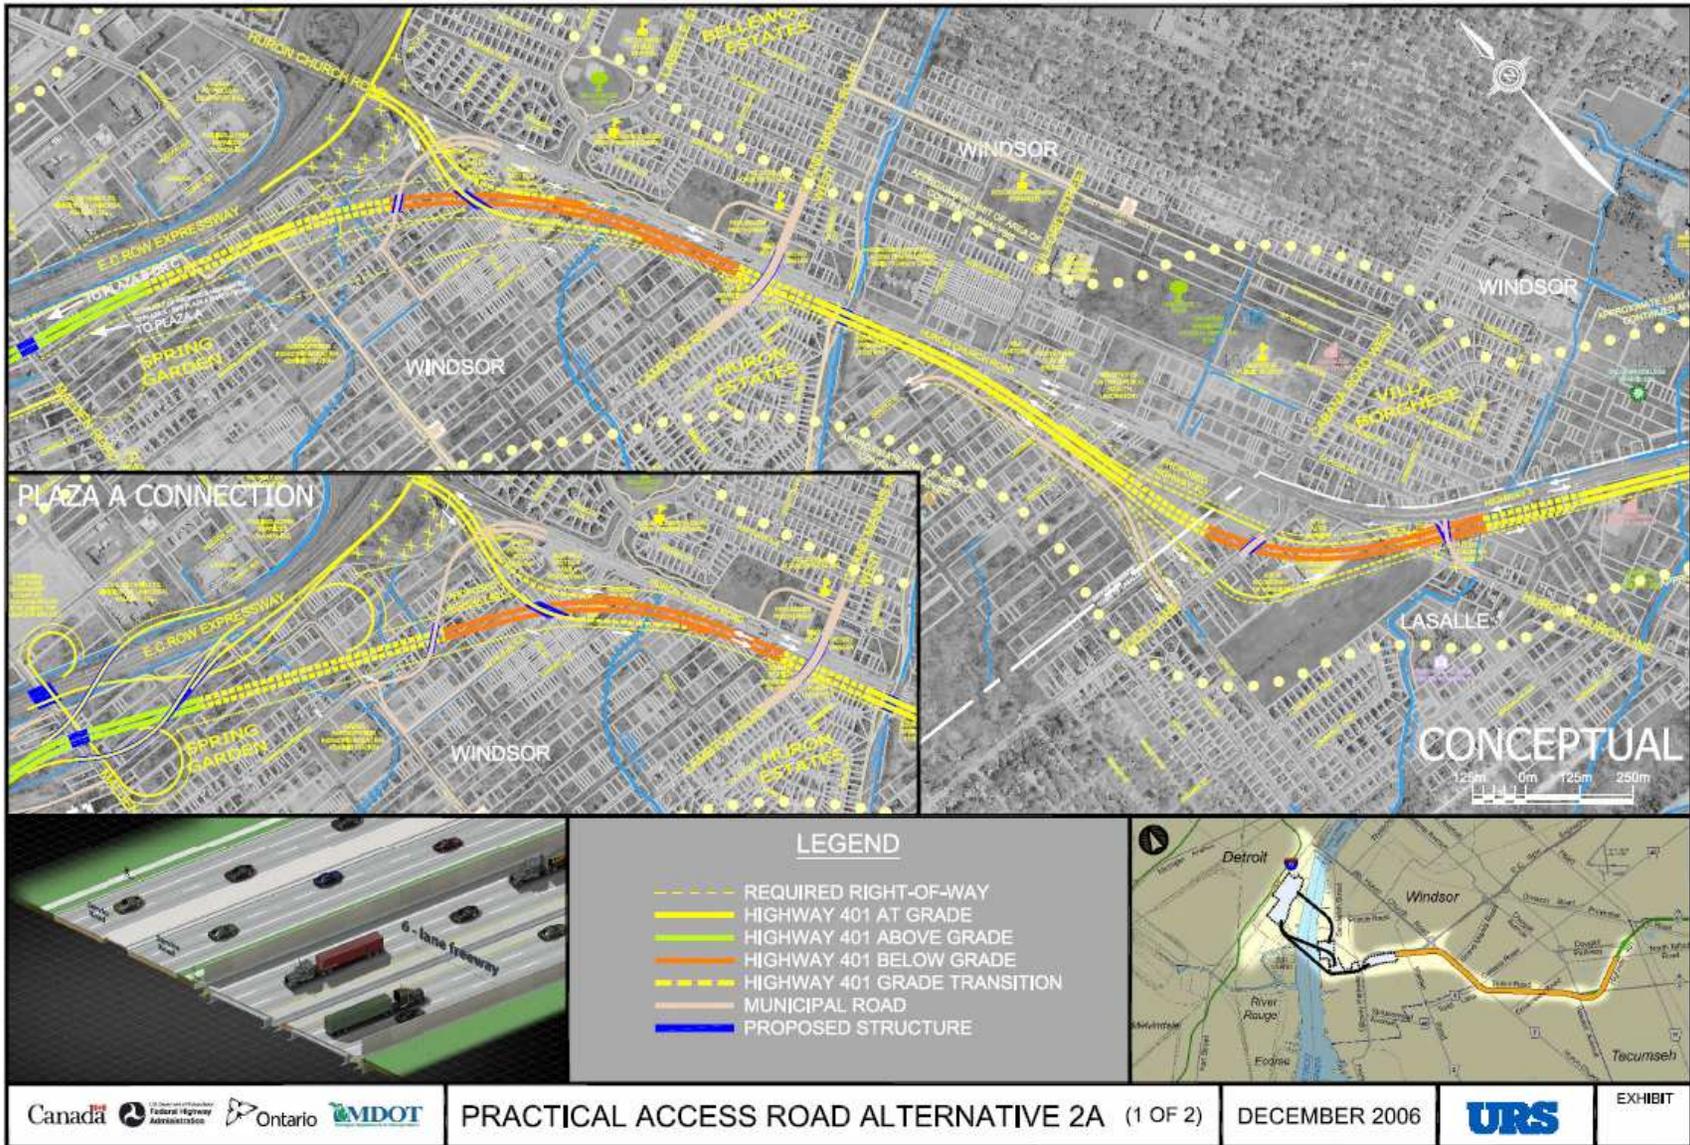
PRACTICAL ACCESS ROAD ALTERNATIVE 2A
